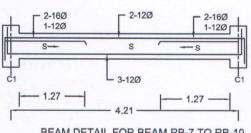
#### DETAILED DRAWING OF REINFORCEMENT OF BEAMS AT ROOF LEVEL
